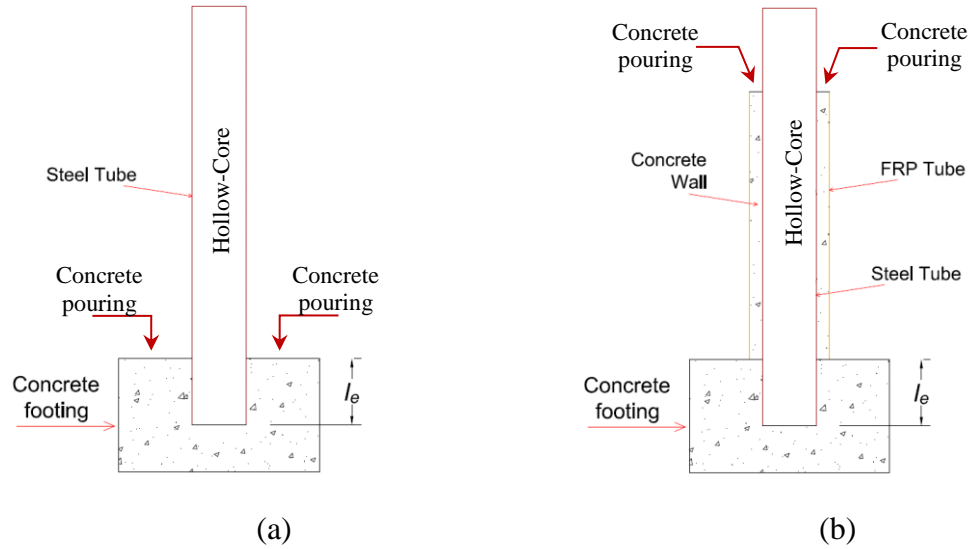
General arrangement of the construction of the HC-FCS column (a) inserting the steel tube and casting the footing, (b) installing the FRP tube and pouring the concrete shell.
